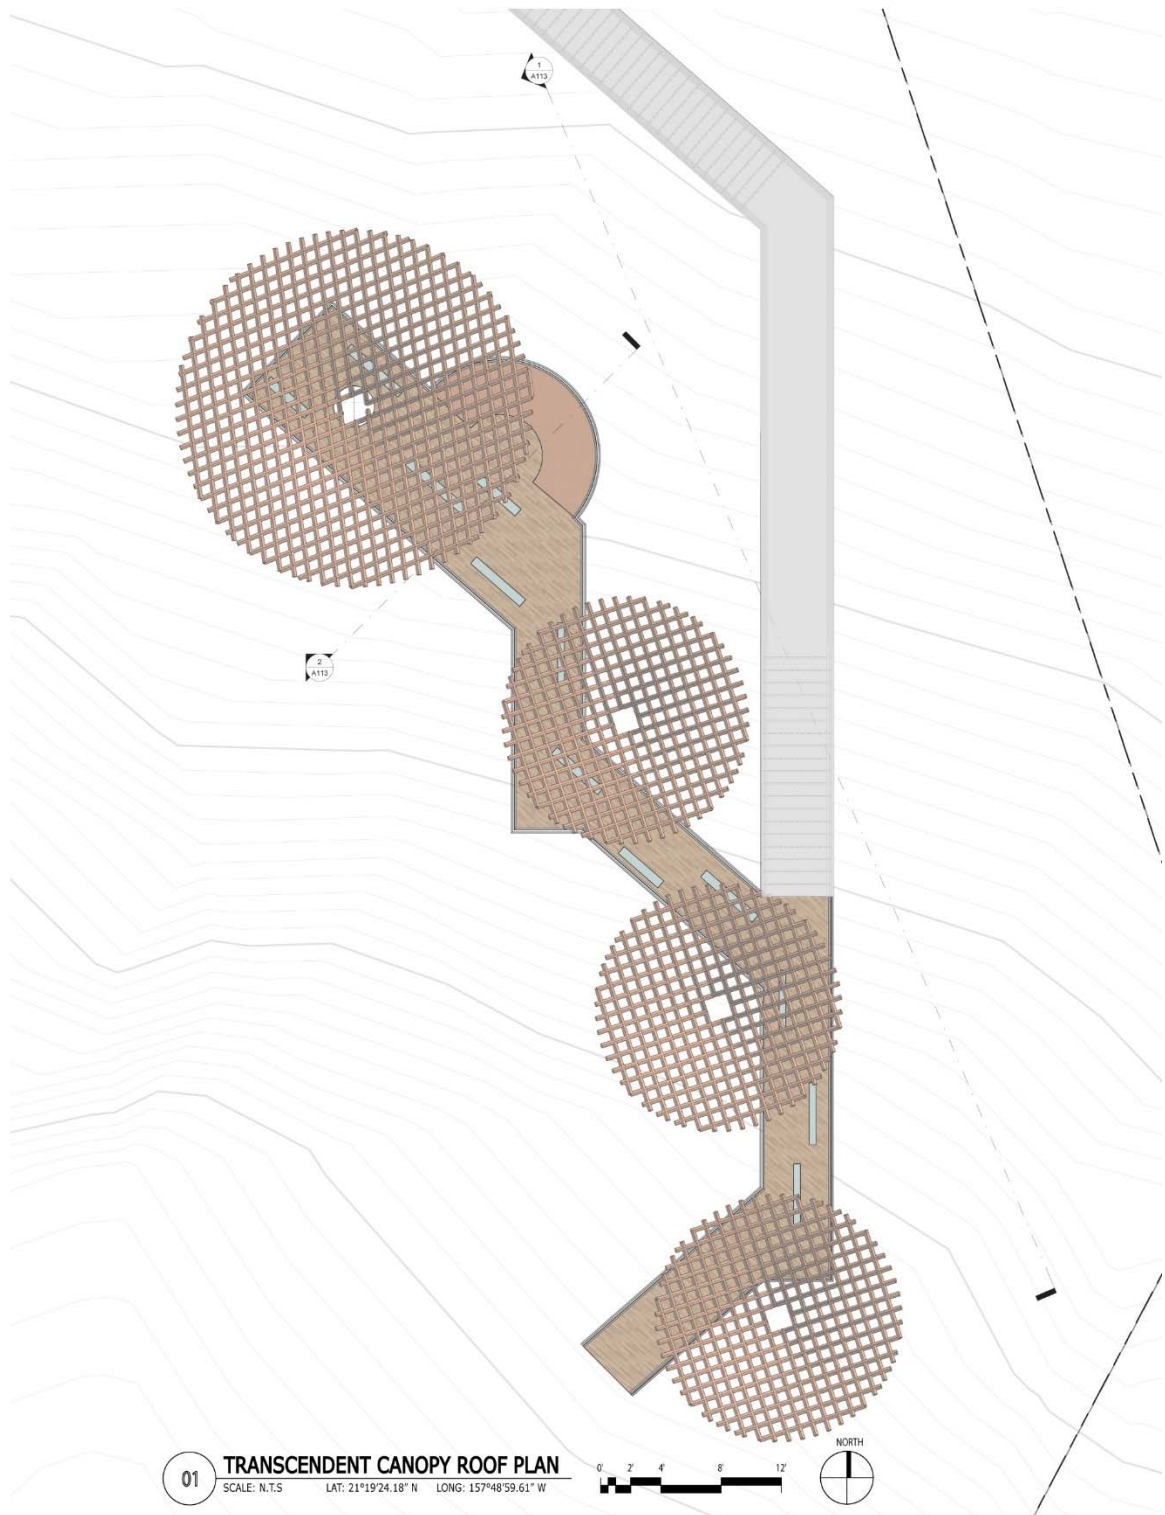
Transcendent Canopy Roof Plan. Made by Author.
